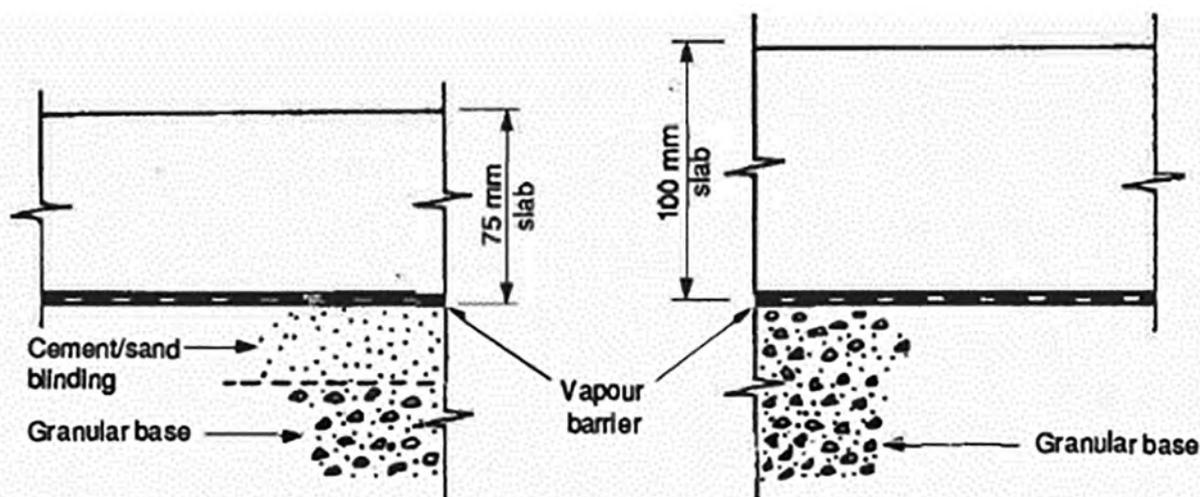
ALTERNATIVE CONSTRUCTION OF GROUND SLABS
